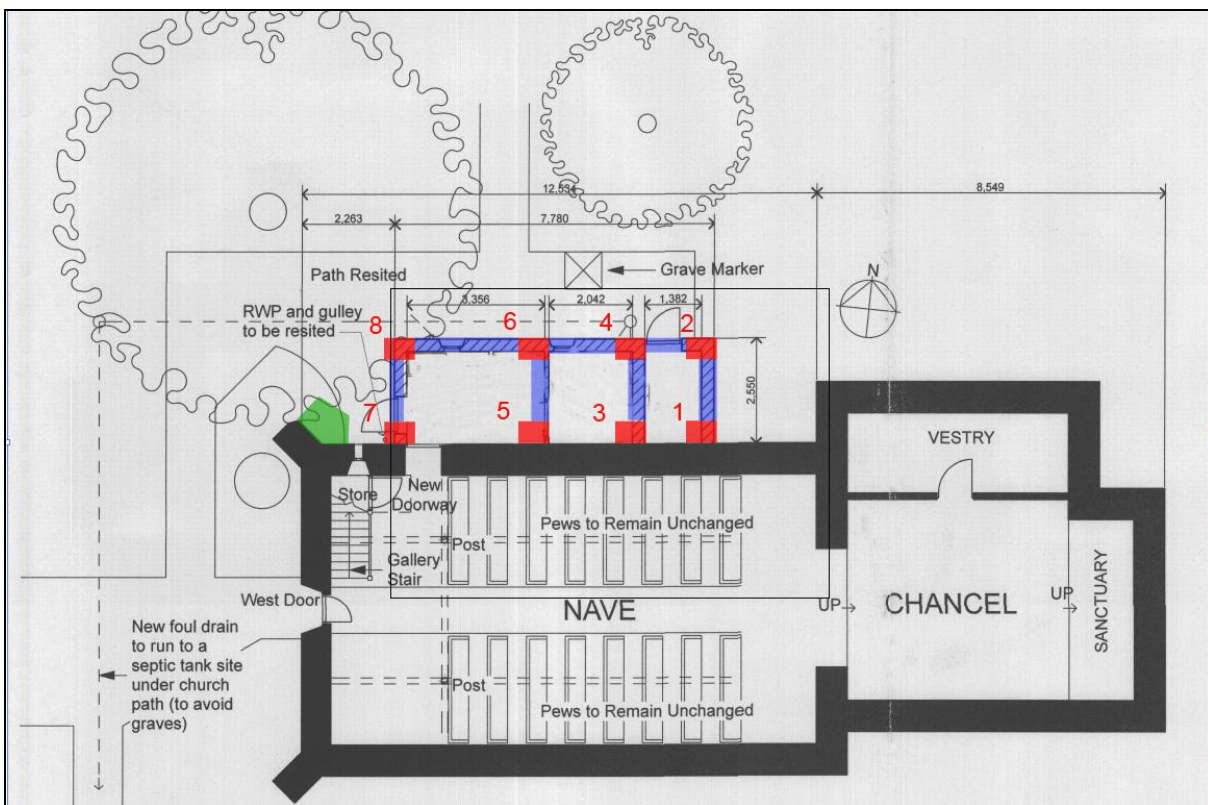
Plan of Trench 1 (foundation pads - red, beam slots - blue and buttress trench - green)
